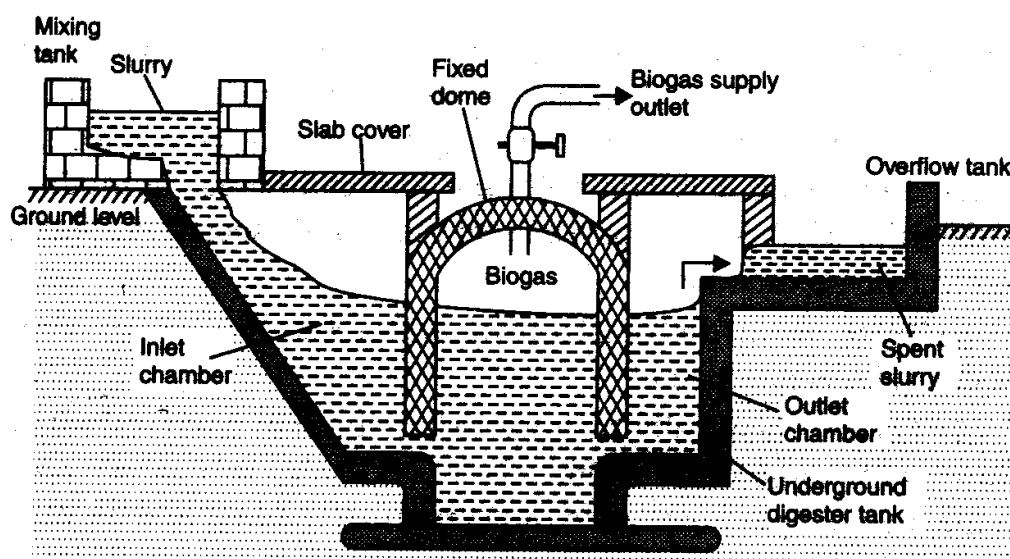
The structure of the fixed dome type Bio gas plant
